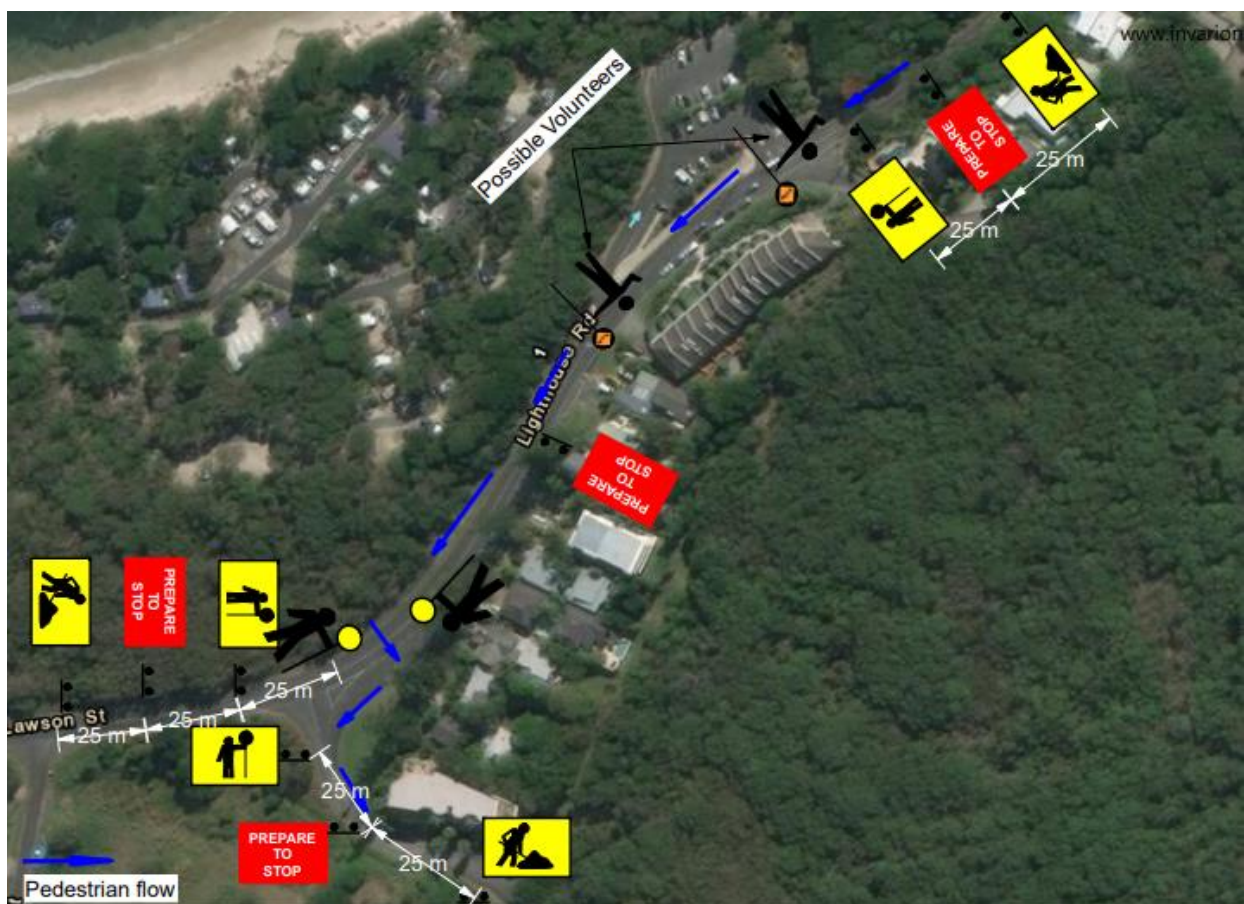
Traffic control proposed for the western section of Lighthouse Road entering Tallow Beach Road (refer to Figure 1.) Traffic control to be in place between 6am and 10.30pm
